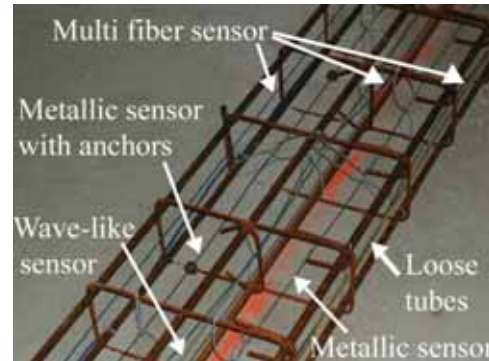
Optical fiber sensing cables fixed on reinforcing bar frame embedded into a concrete slab.
